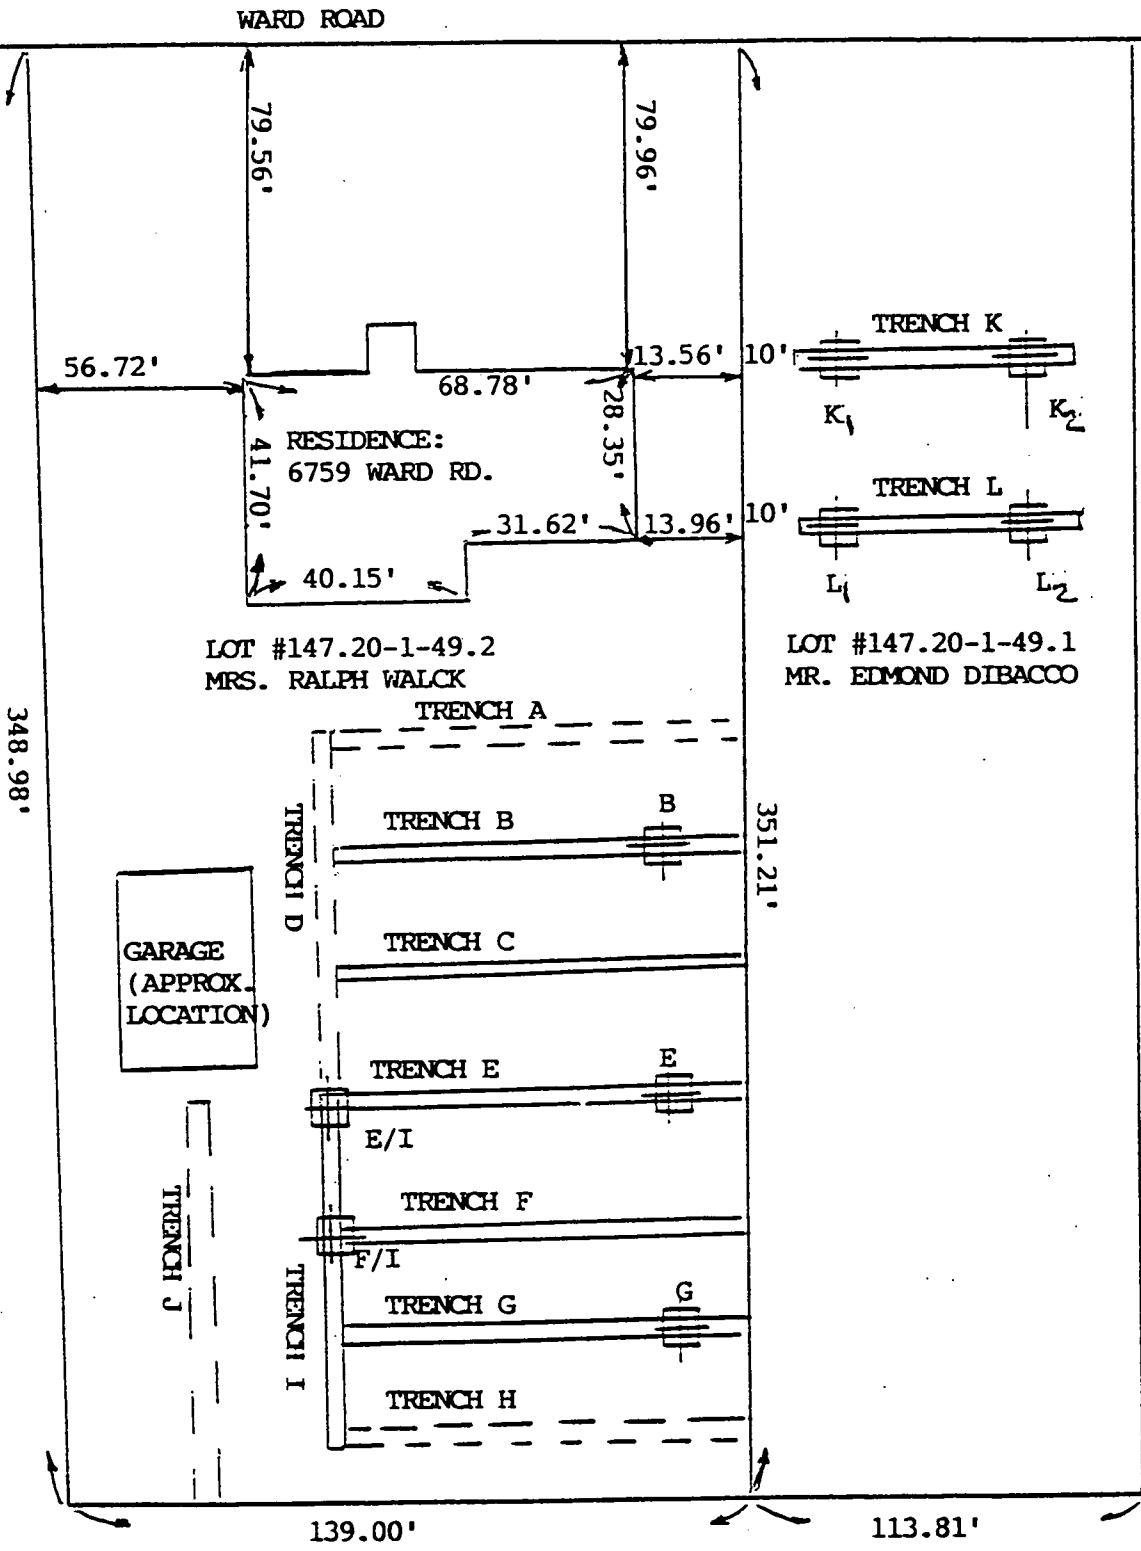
PLANNED SUBSURFACE EXCAVATIONS
